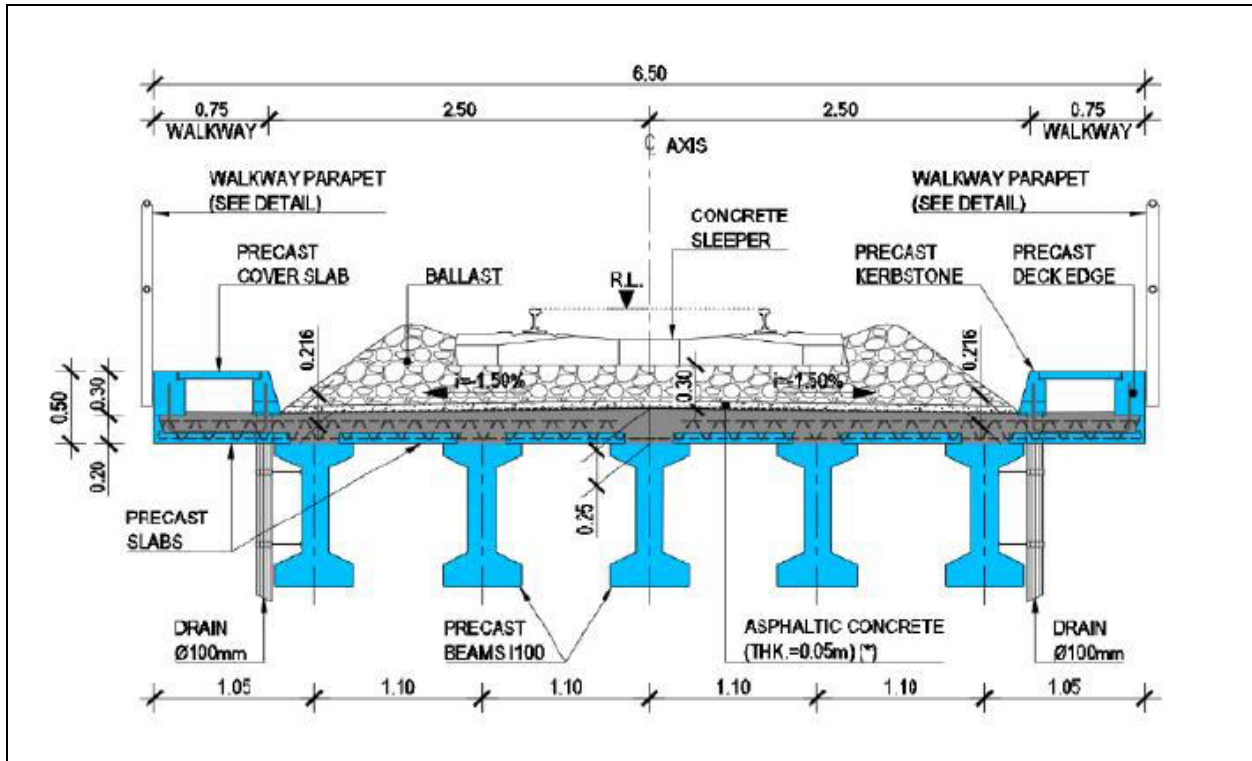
Typical Cross-section of a railway bridge and viaduct
